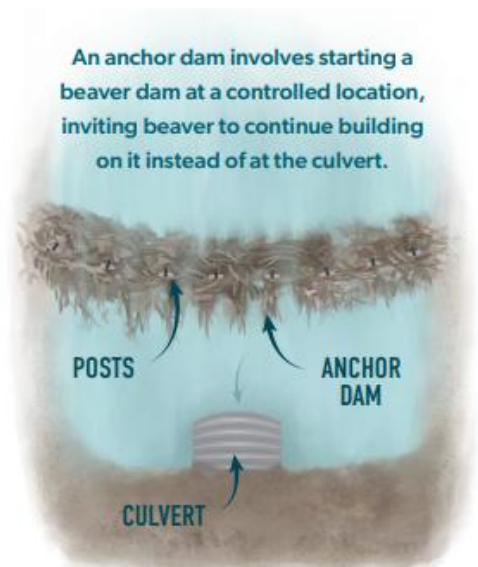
An anchor dam is one solution to prevent beaver from blocking a culvert. Image source: *Project Beaver Culvert Protection Systems*, <https://projectbeaver.org/beaver-culvert-protection-systems>.
